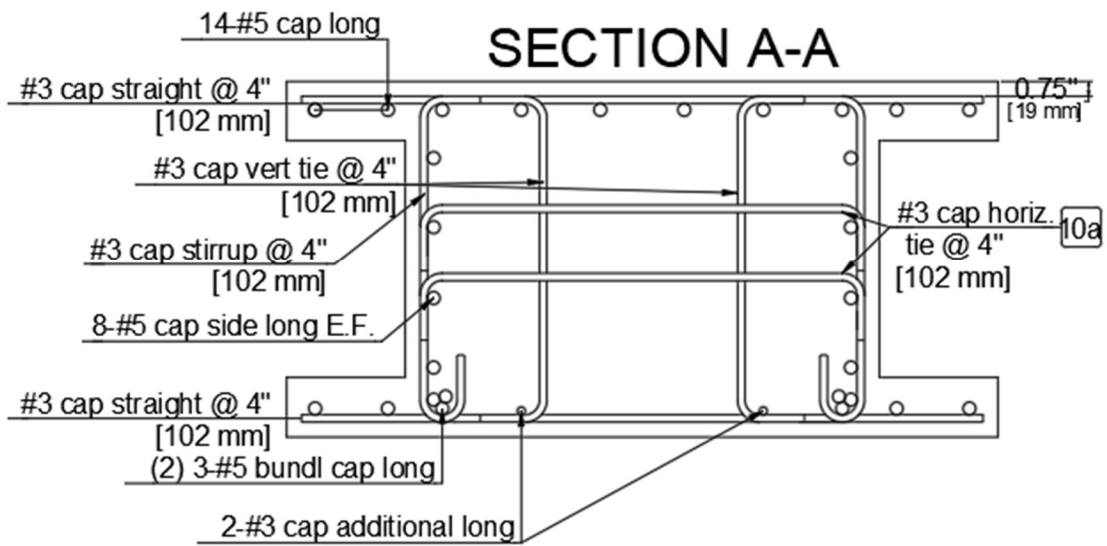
Cap beam cross section A-A, adjacent to pockets
